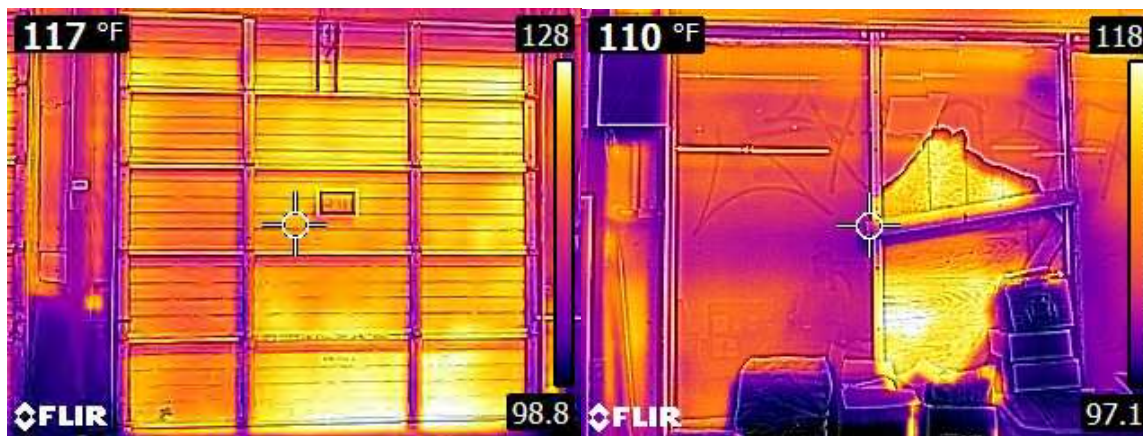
West facing uninsulated roll-up door shows significant heat transfer from solar radiation. A broken window shows even greater heat load from summer heating.
